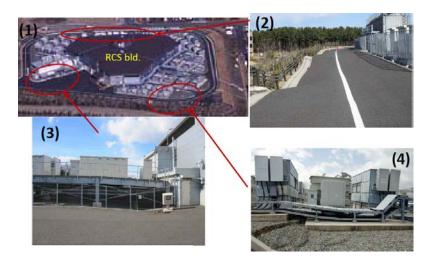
Pictures of RCS facility after earthquake. (1) Bird view of RCS building, outdoor yard, and the surrounding road. (2) Surrounding road of RCS. Wave road. Bump in the middle. Both sides of the bump were sinking. (3) Electric device for RCS facility. Stage for electric power devices leaned. (4) Capacitor bank and transformers. Capacitor bank and transformers were tilted. Cables were distorted with heavy weight on them.
